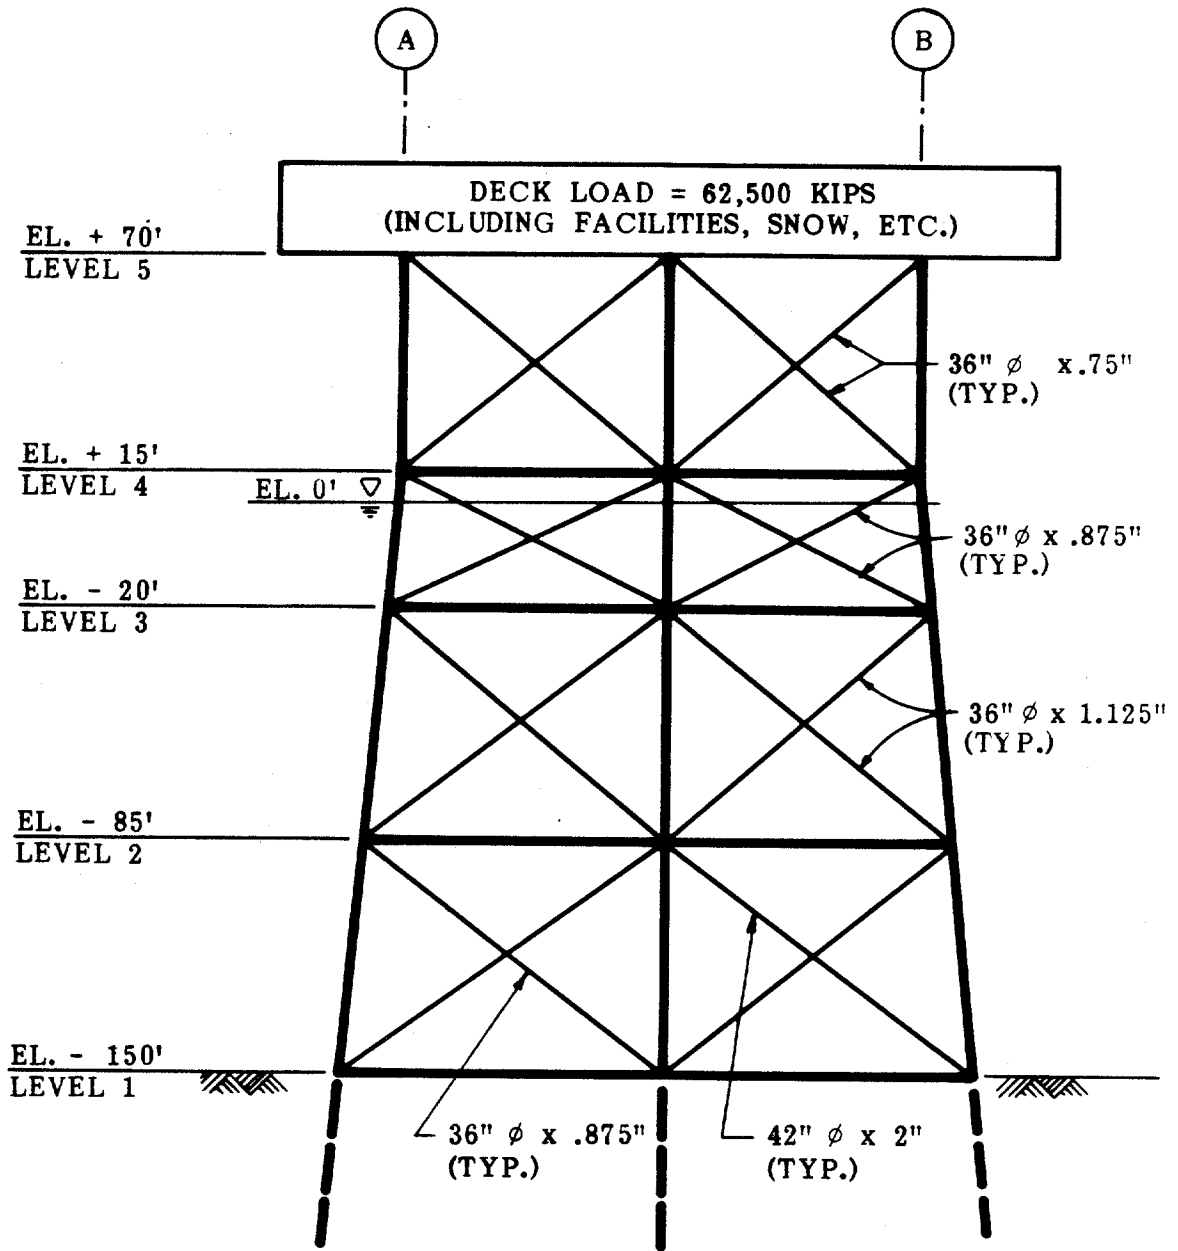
SINGLE PIECE, 150 FT WATER DEPTH PLATFORM, ROWS 2 AND 3
